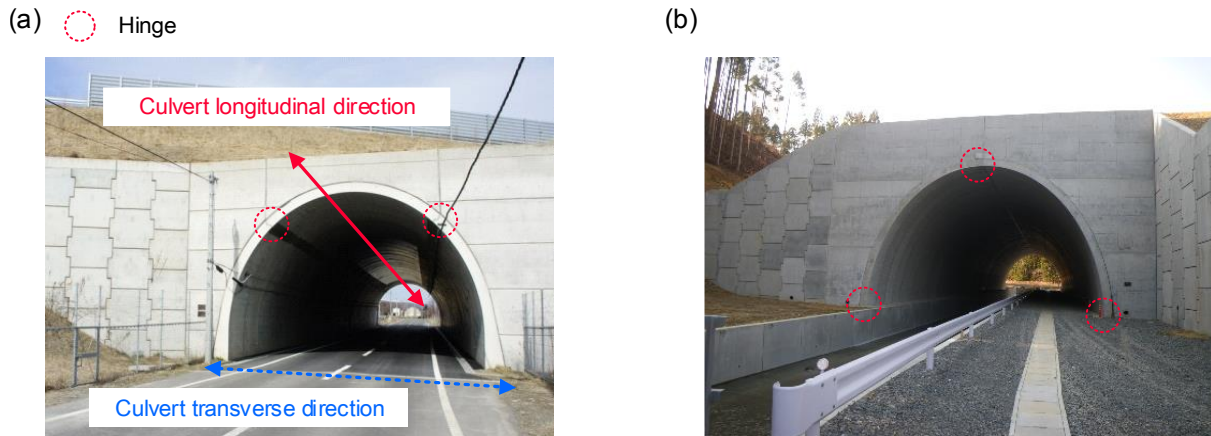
Hinge types of precast arch culverts: (a) two-hinged arch culvert and (b) three-hinged arch culvert.
